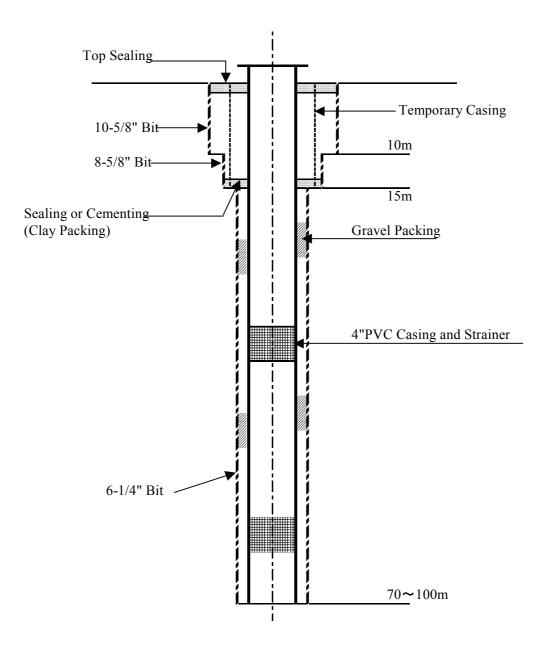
Standard Well Structure (Deep tube well)
